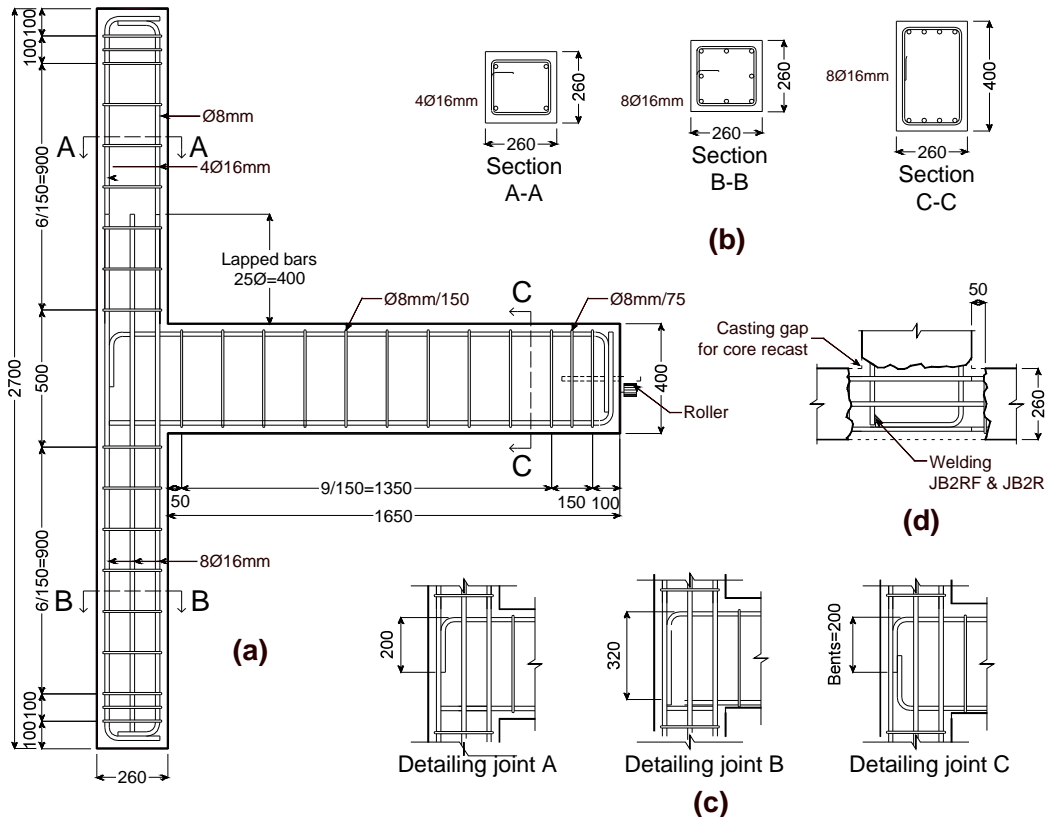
General geometry and reinforcement details of tested joints (units: mm)
